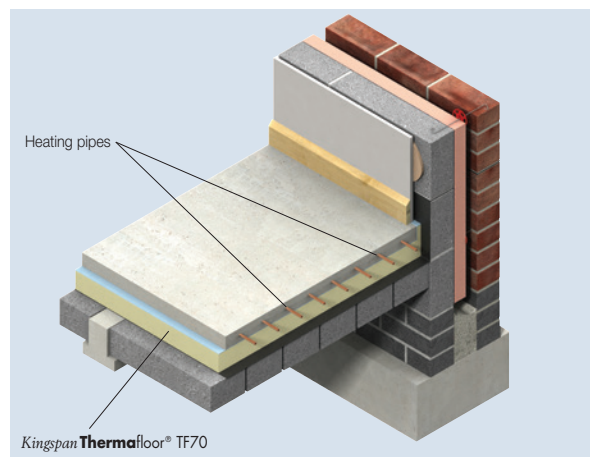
Intermittent Heating Applications – Beam and Block Floor
